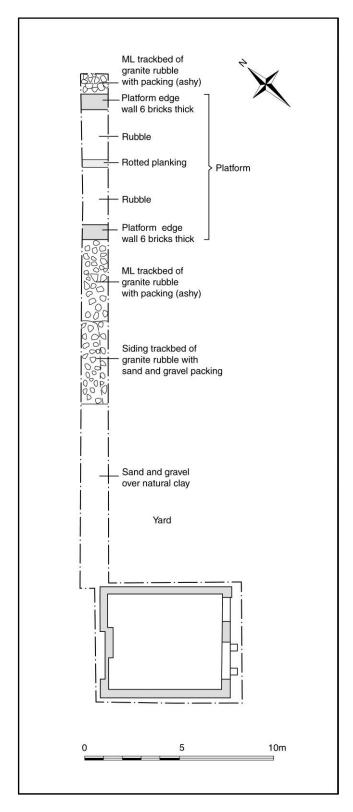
Plan of the freight building and related trench across the main line and platform foundations. For former location of building see historic maps/plans in Figs 1, 21 and 23. (Andy Isham)
